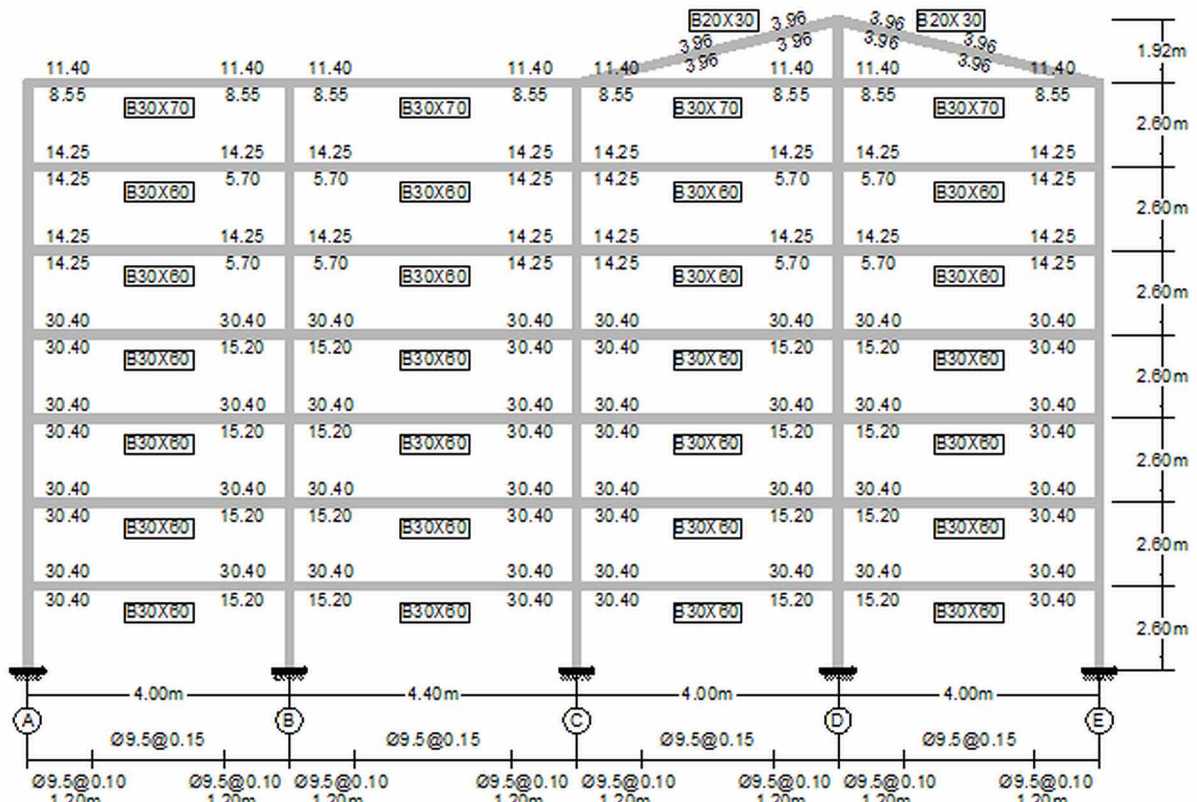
Residential building, geometry and reinforcement in columns of the frame 4
